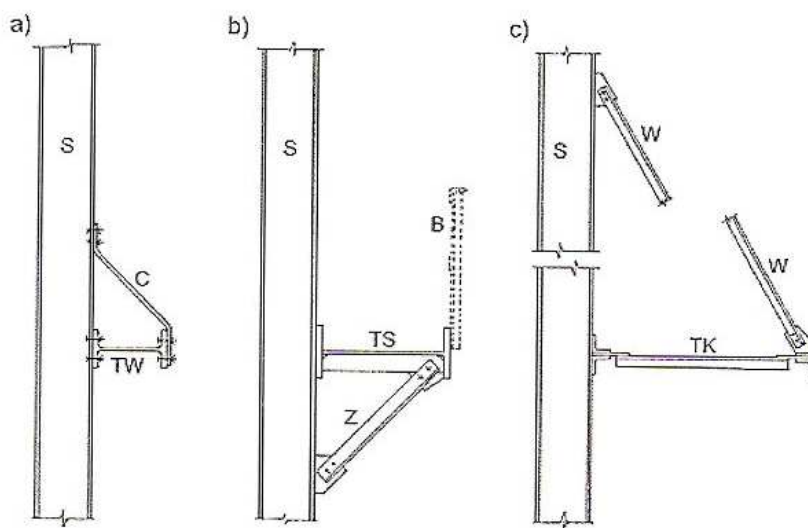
Constructions of wind horizontal bracings: S- column, TW- bracing from rolled member, TK- truss bracing, TS- built-up bracing, C- tie, Z- diagonal stay, W- suspension member
